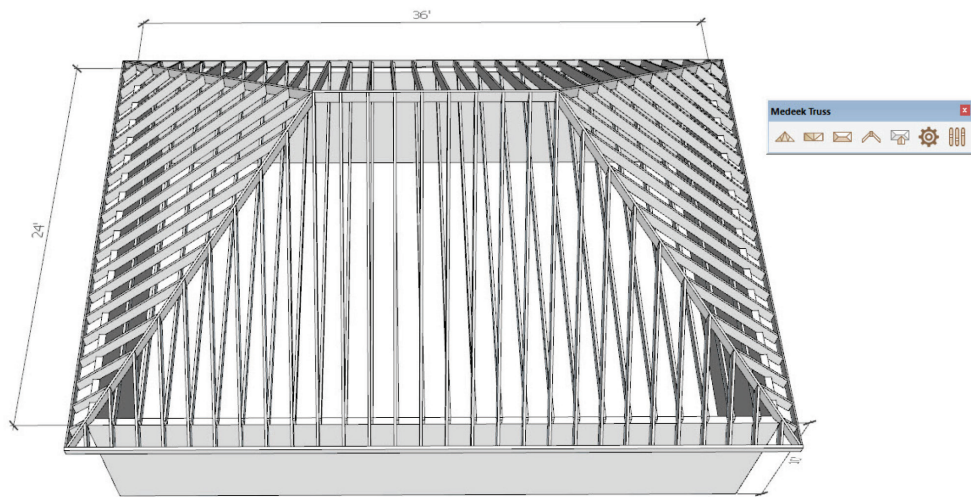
Framed Roof Using Medeek Roof Extension.
